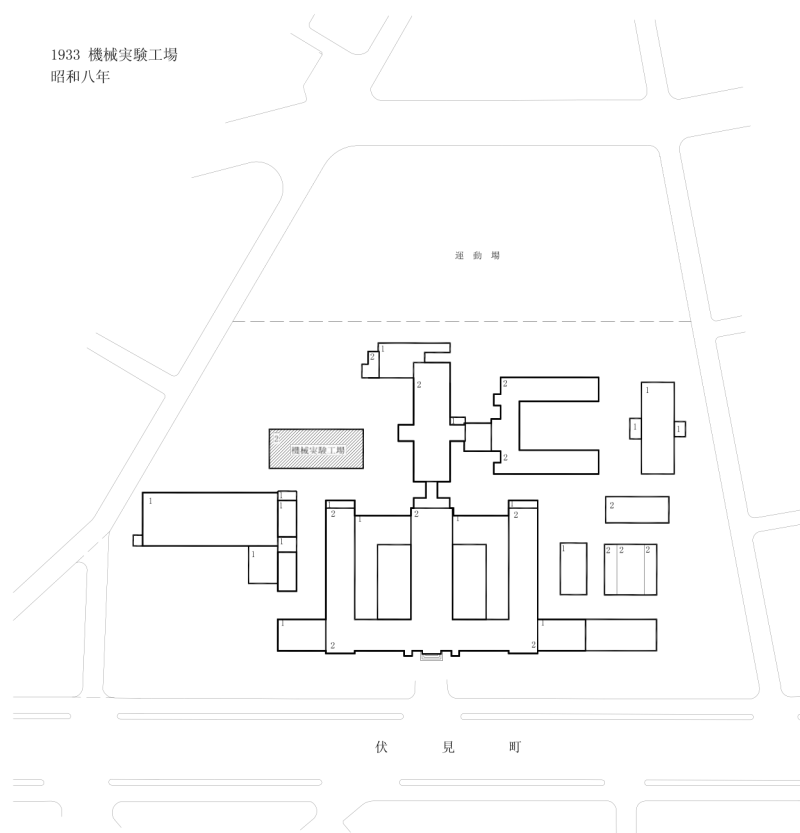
The Retraced Site Plans of Nanyuan Campus Before 1945
